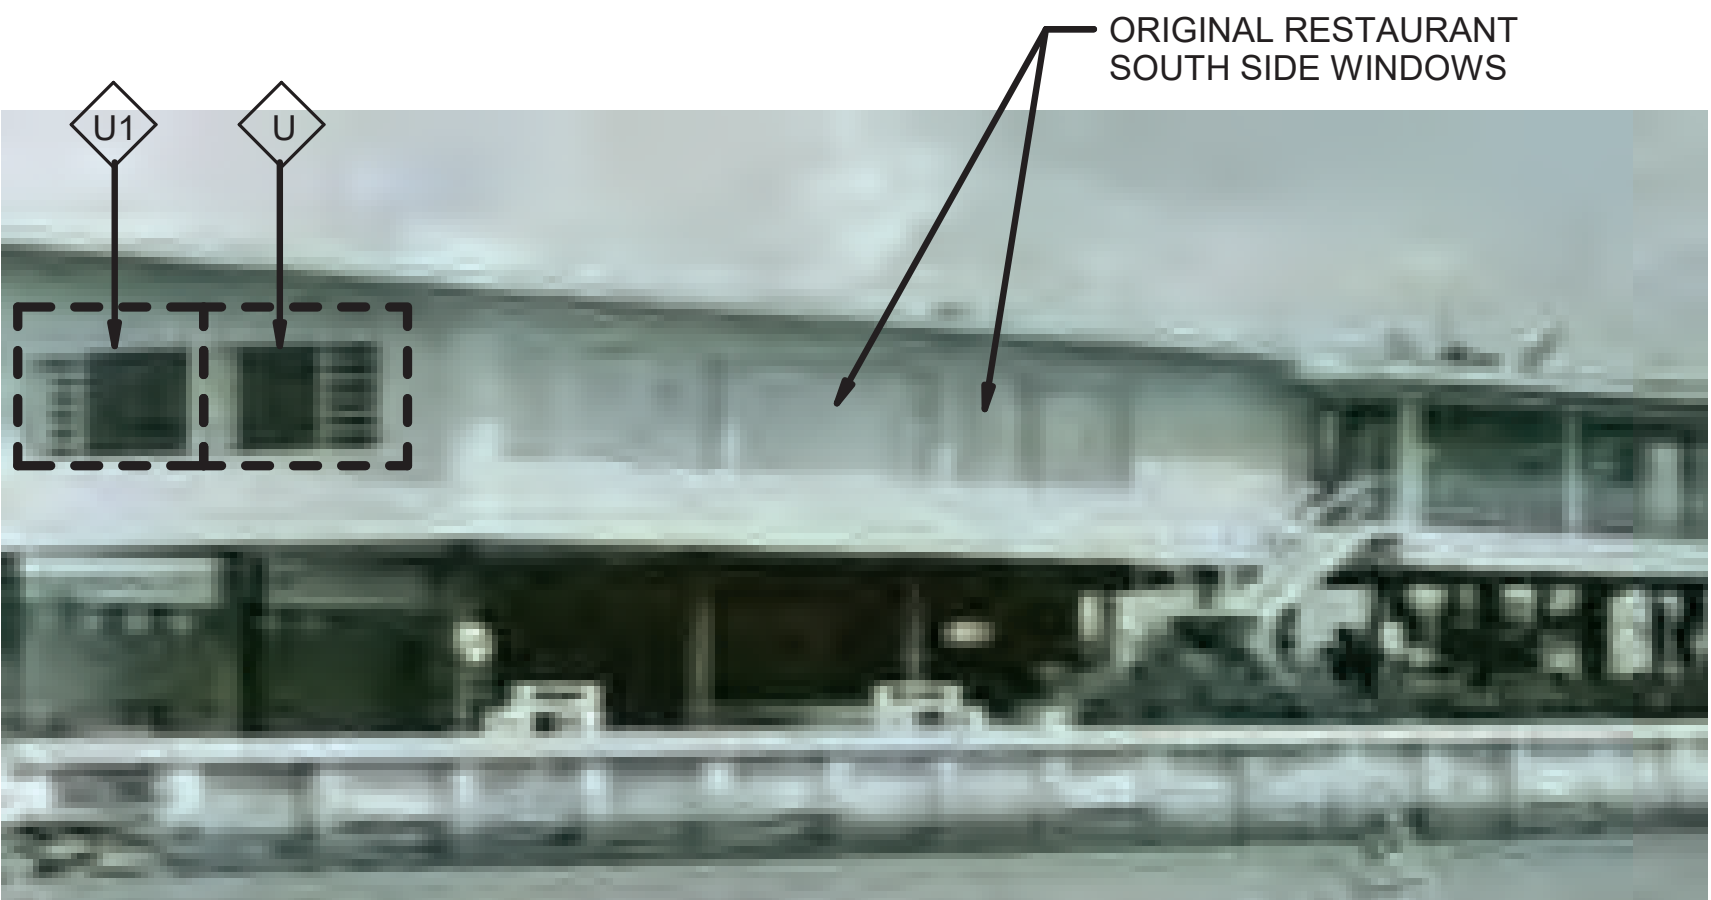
SOUTH AND EAST ELEVATION WITH ORIGINAL RESTAURANT WINDOWS (1959)
